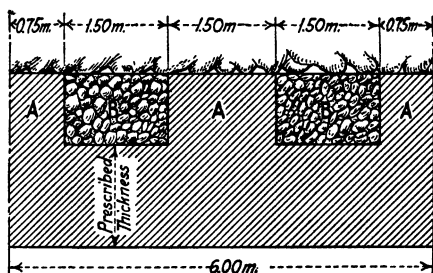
PLAN OF MASONRY CONSTRUCTION, WHERE DISTANCE BETWEEN INTRADOS AND ROCK WALL WAS GREAT.
